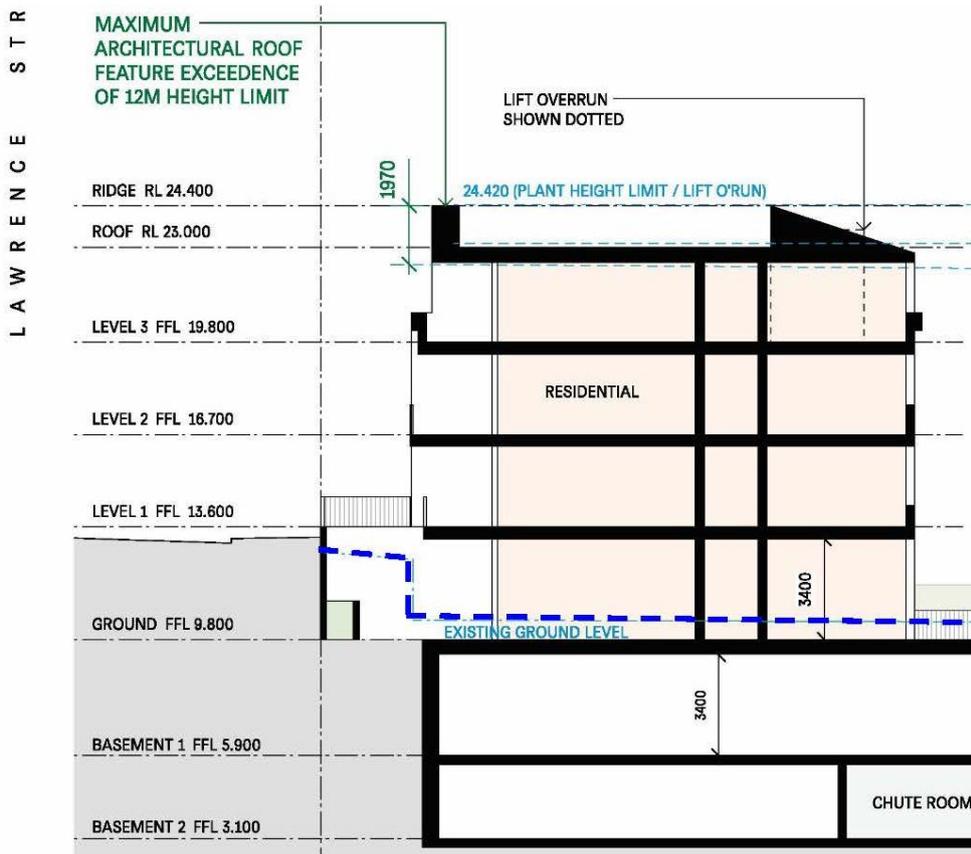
Section B original DA – Lawrence Street below ground apartments (existing ground level in blue dash)
